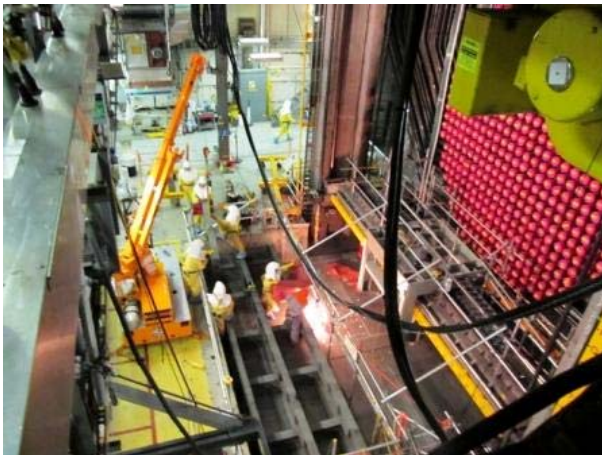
Work crews in the Unit 1 vault re-install the refurbished fuelling machine bridge and carriage.
